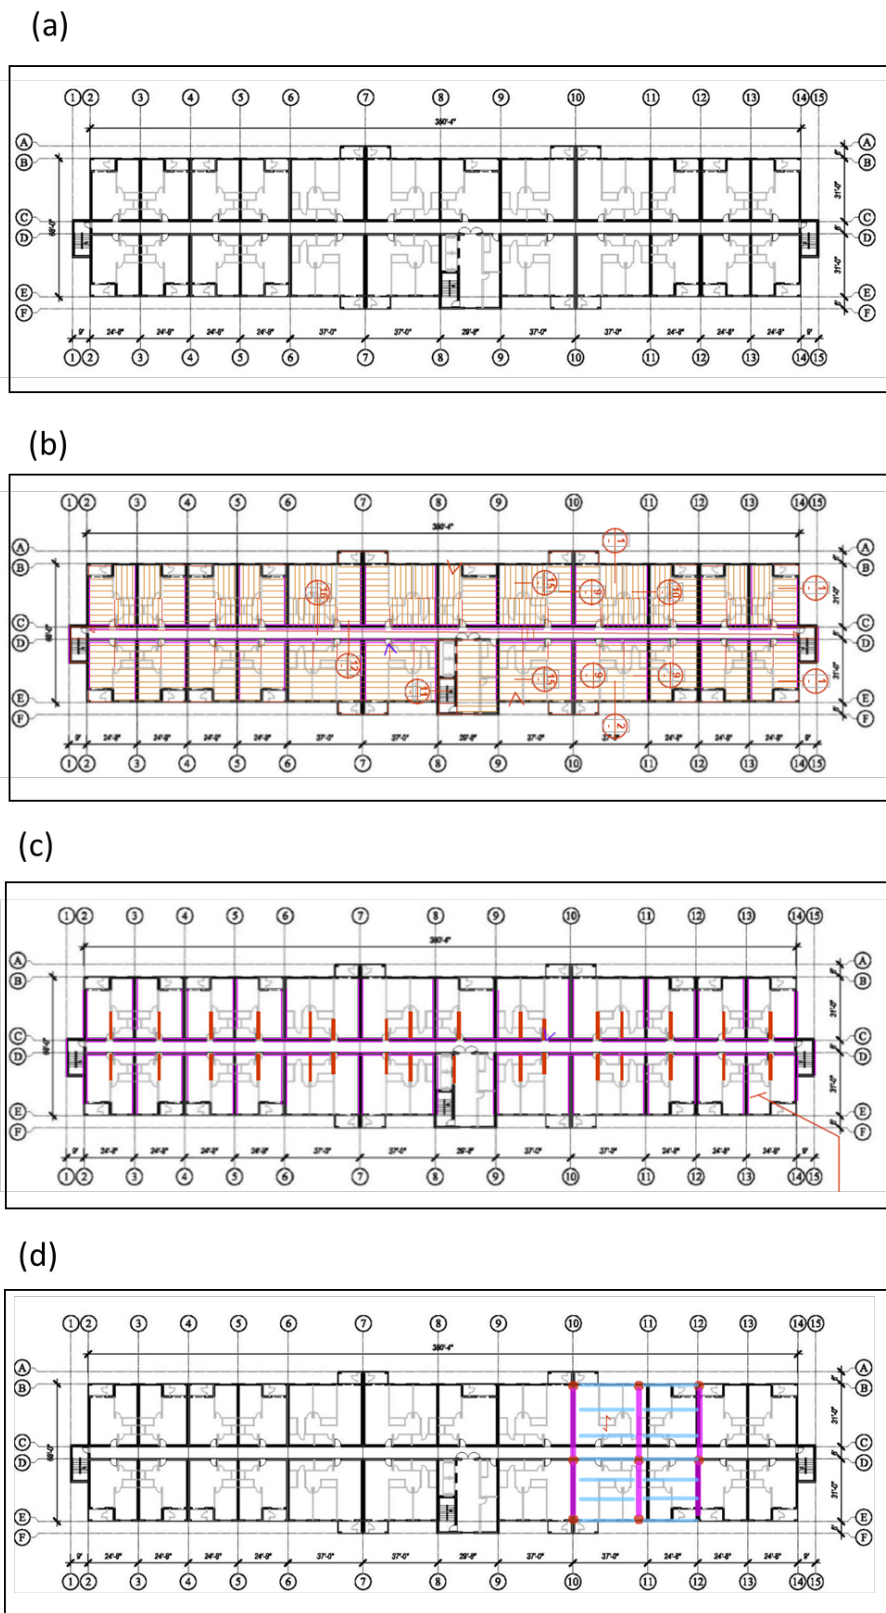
Typical floor plans (a) ICF, (b) traditional wood, (c) CLT, (d) steel frame
